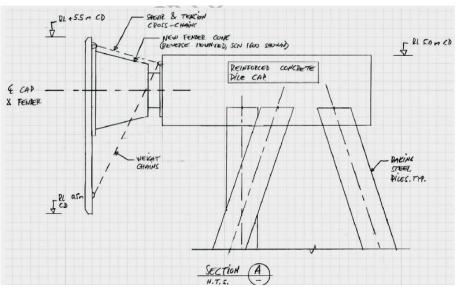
Elevation sketch of the proposed new berthing dolphins at Cairns (Source: Arup).
